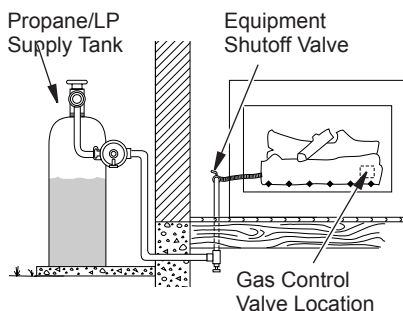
Checking Gas Joints (Propane/LP Model Shown)
